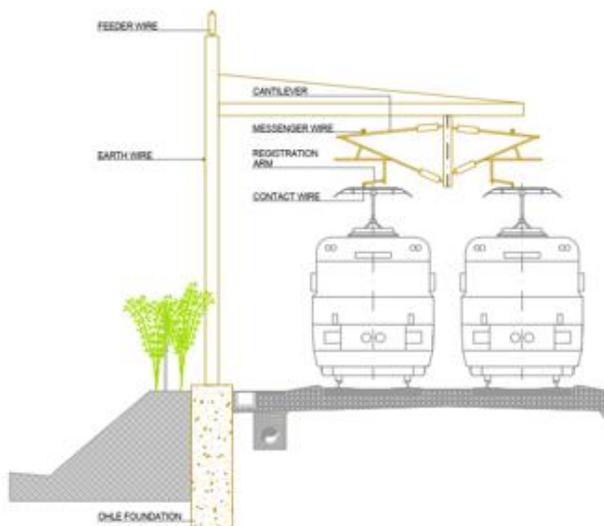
Typical OHLE Arrangements in 2-Track Section – on entry to the East of the Station
